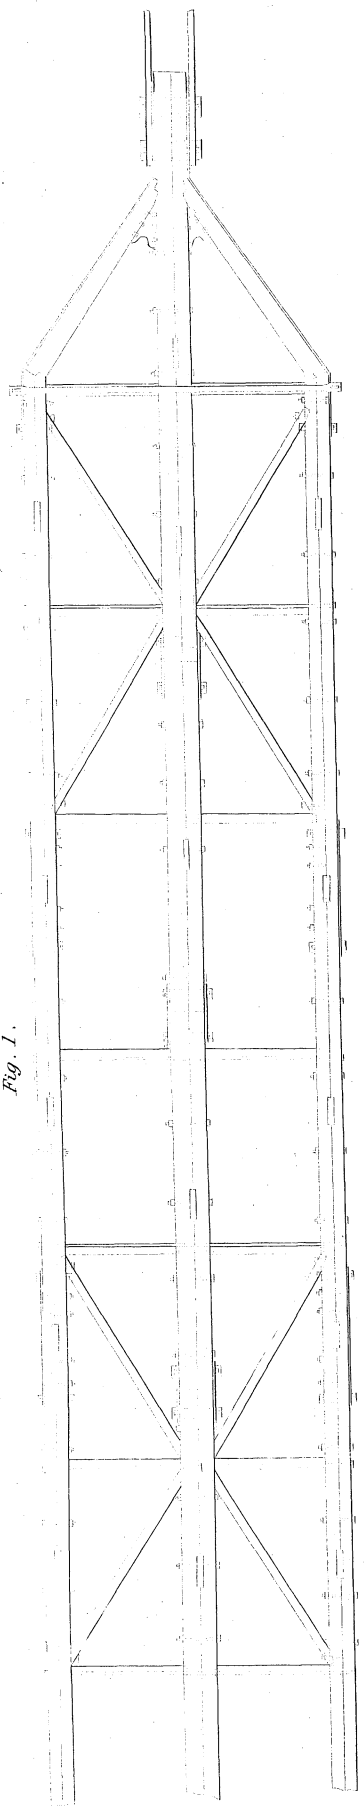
FIGURE ONE, is a plan of the sliding-frame and cradle, used when drawing vessels from the Dock to the shore.
